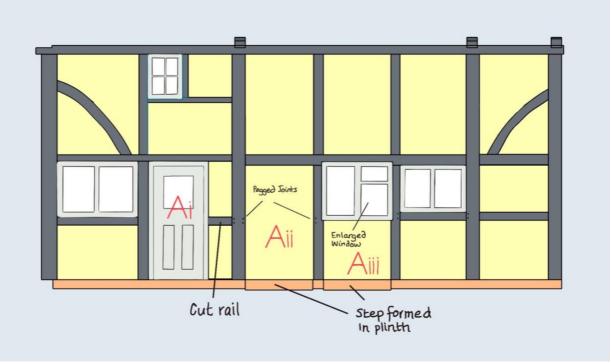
, East Elevation of Main Range, showing possible positions of doors. (Author 2019)
